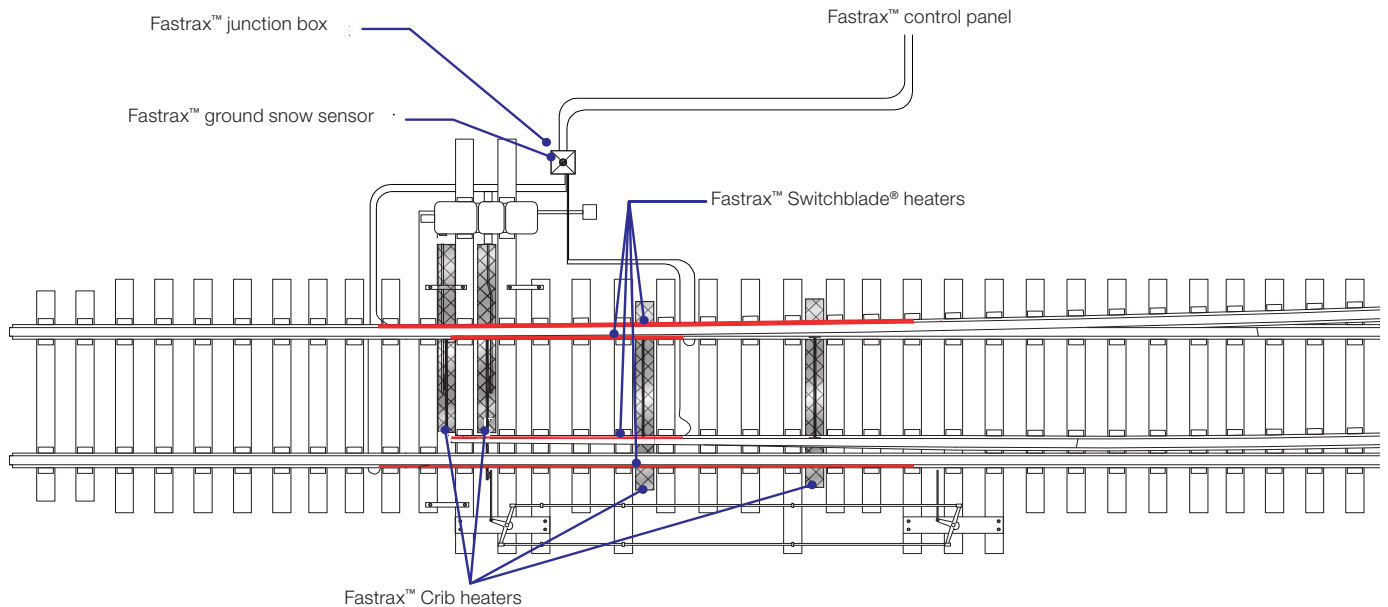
Typical Running/Stock Rail Heating Layout - Equipment Detail, No. 14, 15 or 16 Standard Switch Size (All Tie Styles)
